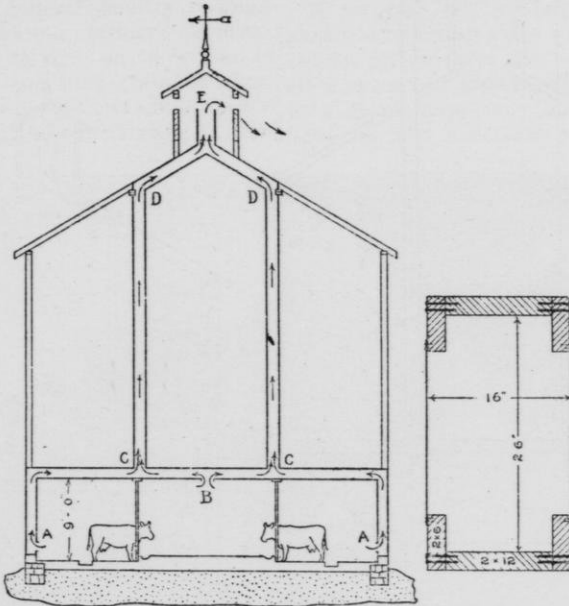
Shows method of ventilating an ordinary barn, where the air is taken out of the stable through flues built between the studding and between the joist of the ceiling. The air then rising, through ventilating shafts, made against or as a part of one or more of the purline posts. The air enters at A A and B, following the arrows and passing out along the lines C D E. These ventilators, if desired, can be carried out straight through the roof, or may be terminated inside under the purline plate, or as represented in the figure. The cross section at the right shows how 2x12's and 2x6's may be nailed together and placed so as to constitute a purline post, and at the same time a ventilating flue. The two sides of the purline post or ventilating flue are represented closed with sheets of galvanized iron. They may also be closed with well seasoned matched flooring. The number of bends necessary in this plan is an objection, as they interfere with the draft more or less.
